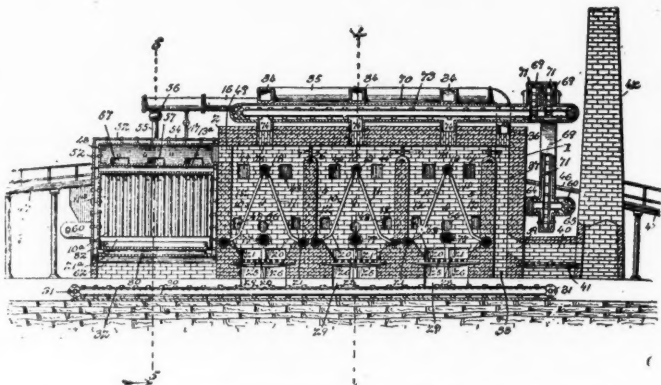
LONGITUDINAL SECTIONAL VIEW OF ENTIRE CREMATORY.
